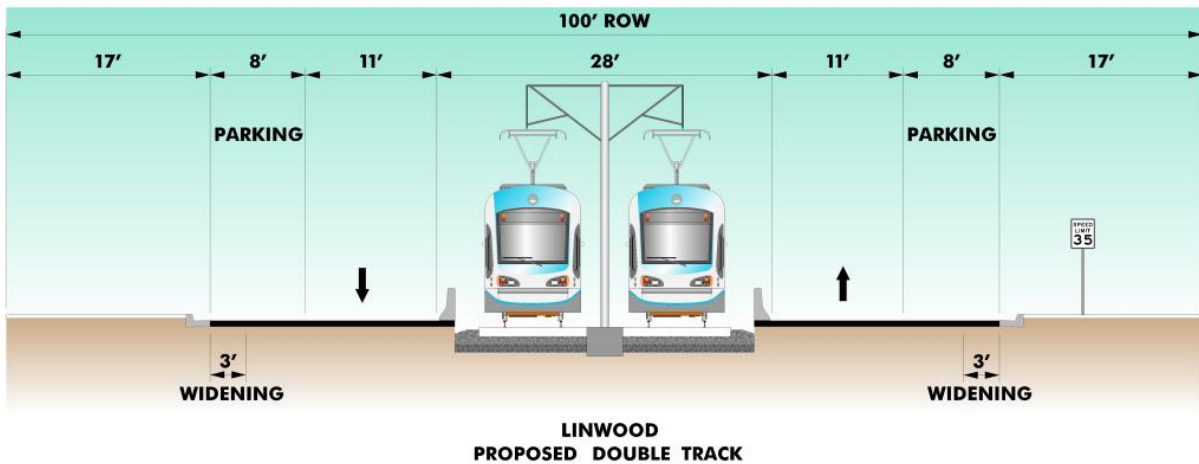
Enhanced Streetcar Linwood Blvd Typical Section
